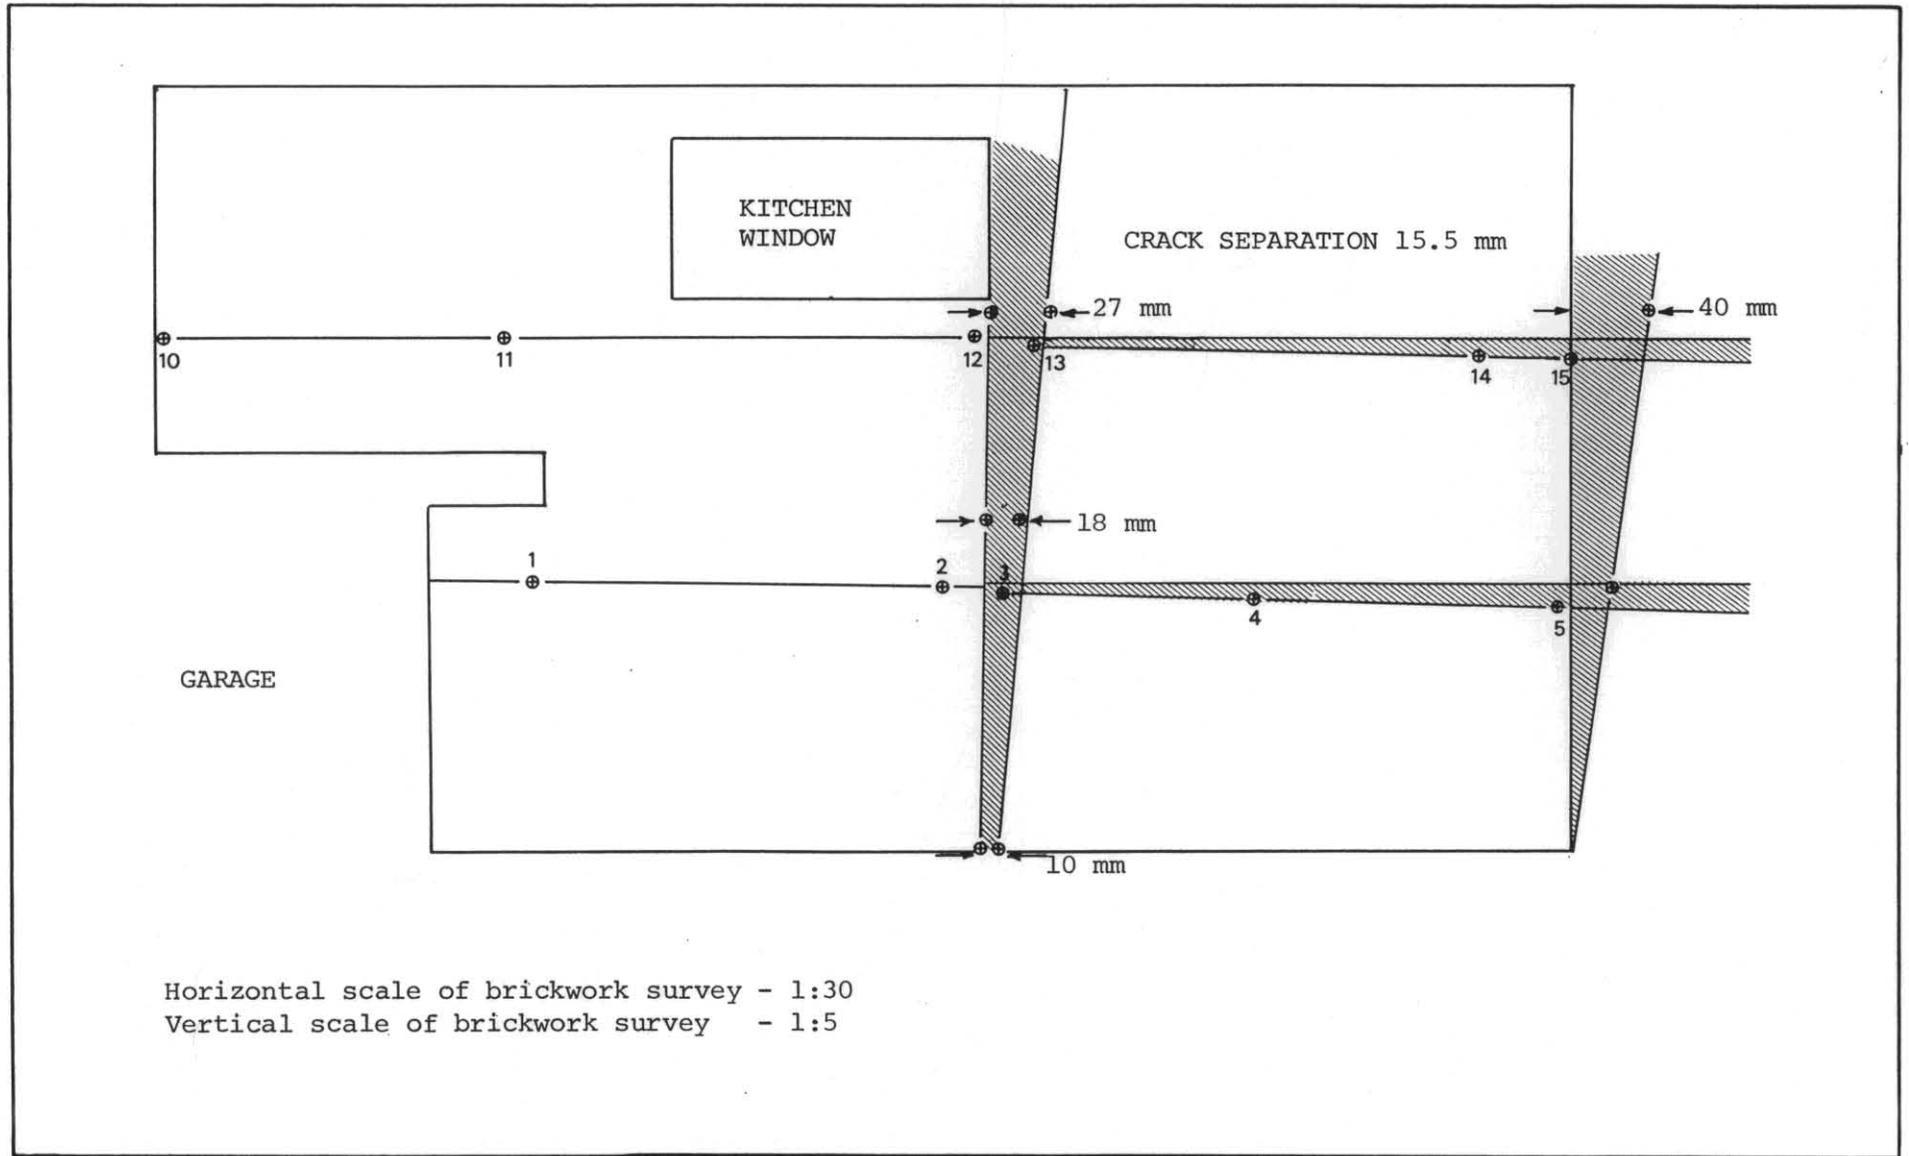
Diagrammatic representation of vertical and horizontal brickwork survey, south wall section.
